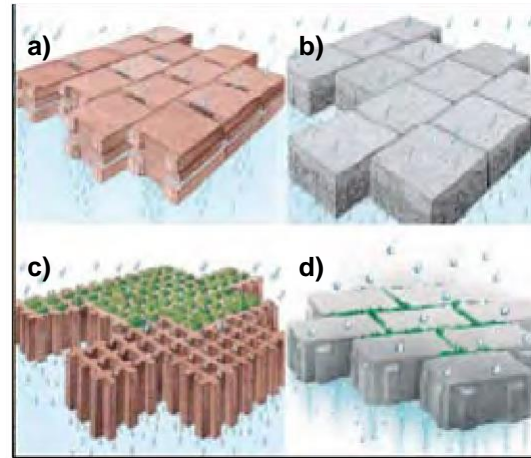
Types of permeable paving: a) pavers with canals b) porous pavers c) greened permeable pavers with small apertures d) greened permeable pavers with wide joints. (Dierkes et al. 2002.)
